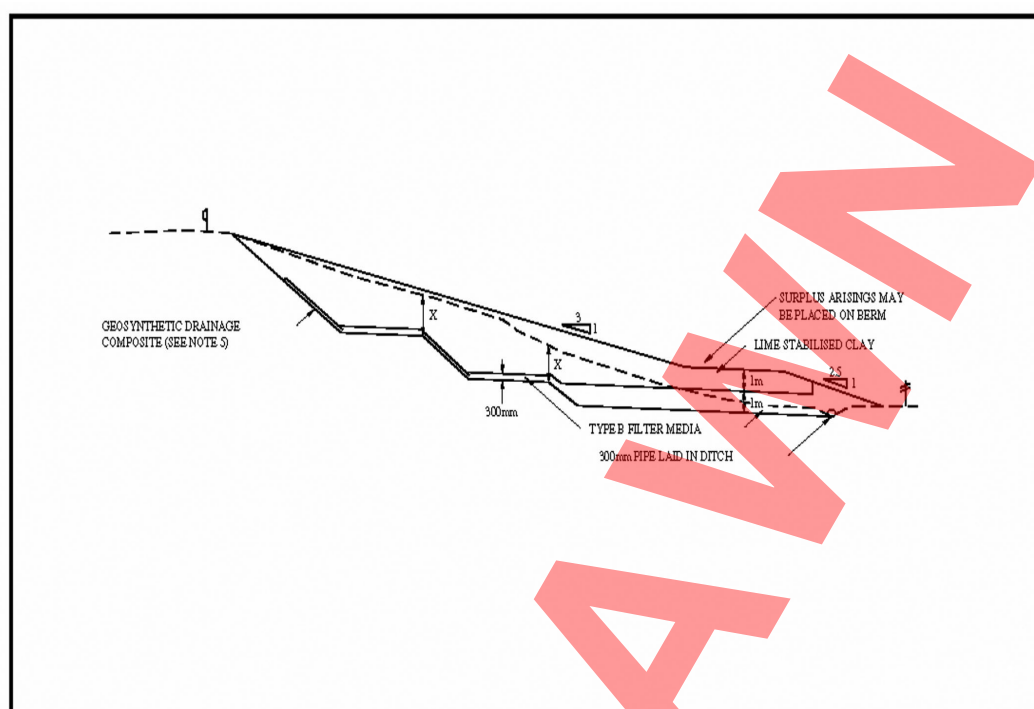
Typical Section for a Lime Stabilised Clay Slope Repair on an Embankment
